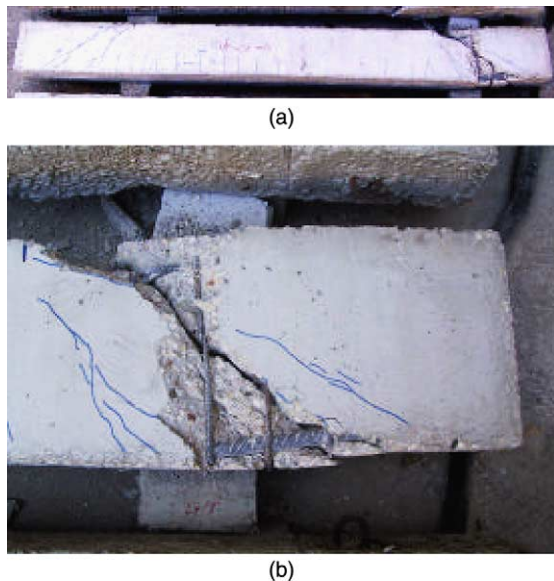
Shear failure of beam B02: (a) general view; (b) detail.
